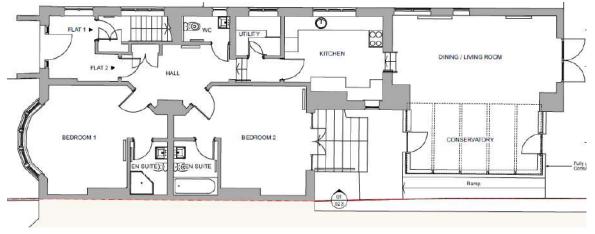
No 25 Oakhill Avenue Existing Ground Floor Plan
